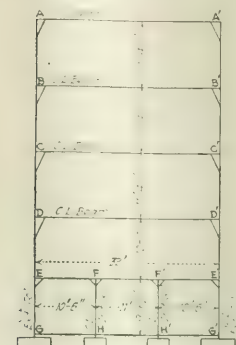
OUTLINE OF FRAME TO BE INVESTIGATED
